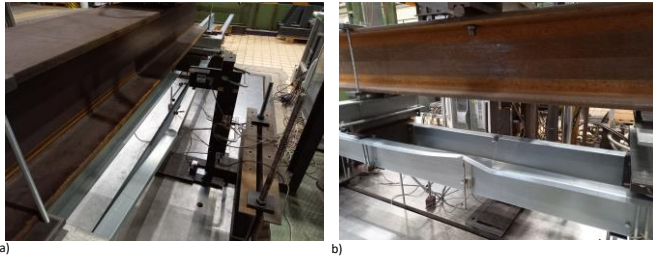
Test specimen (Z-shaped section) after testing and unloading a) lateral-torsional buckling at long length b) distortional buckling at short length
